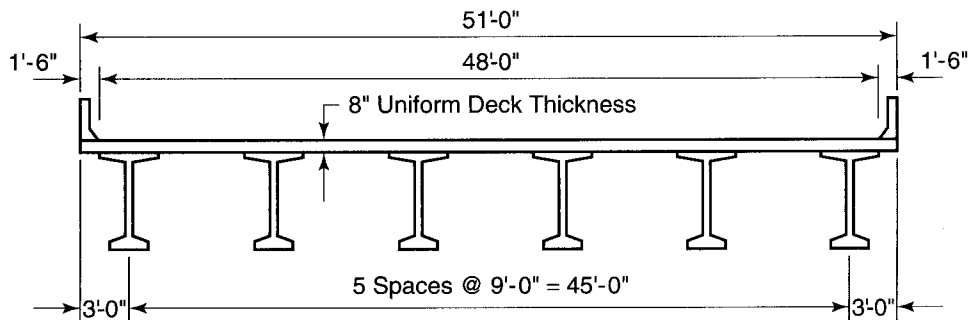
Bulb-tee Bridge Deck Cross Section in Example 12.1 (Ref. 12.11)
